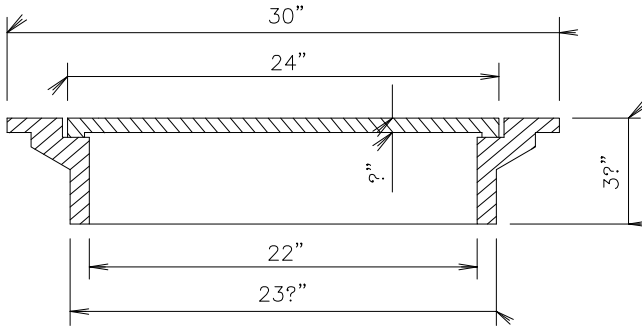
MANHOLE FRAME AND LID-TYPE B
